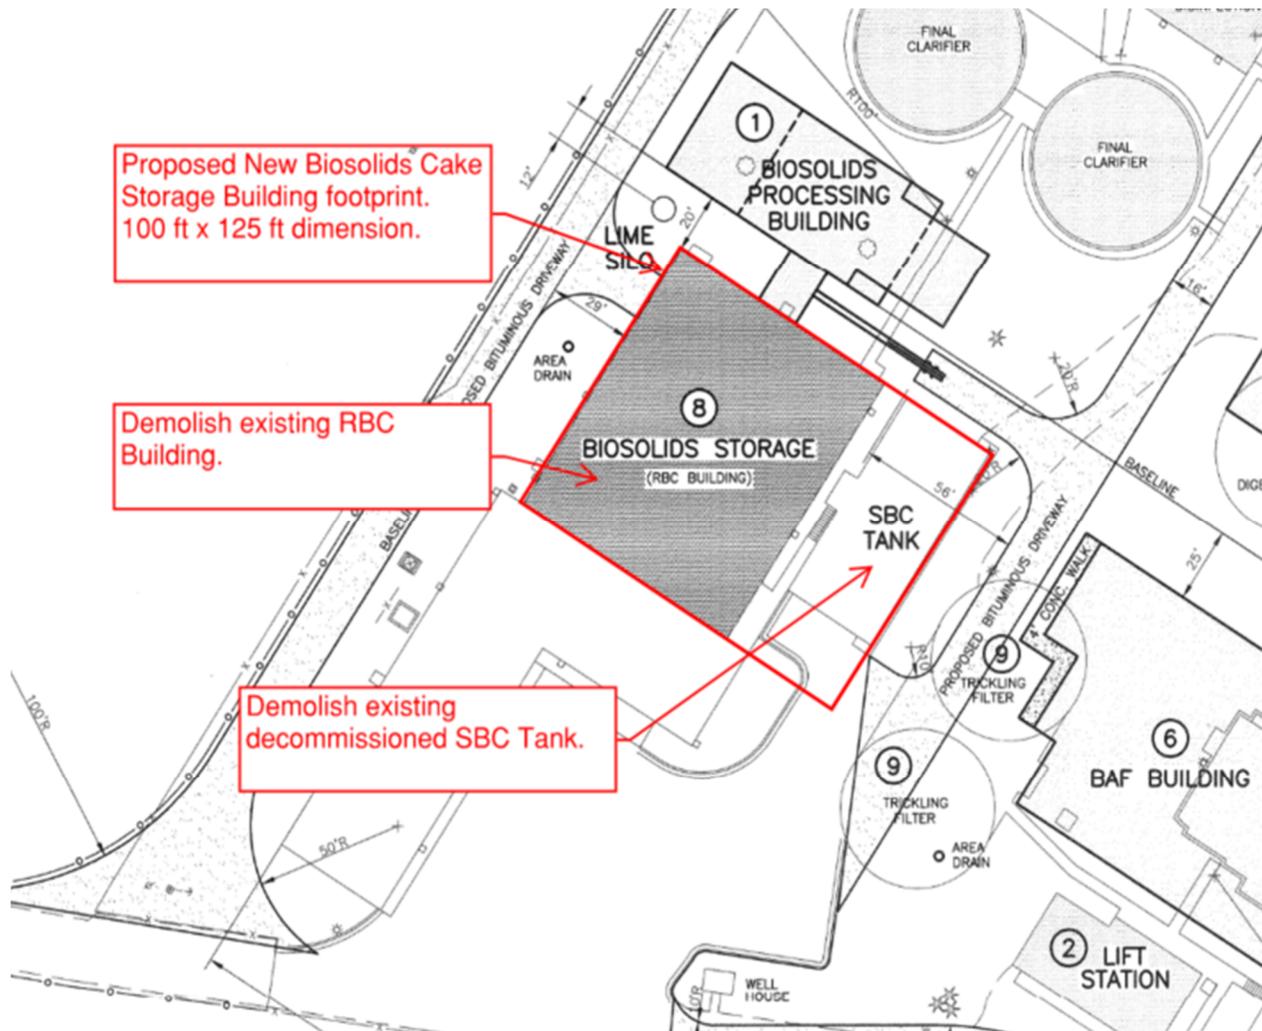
Layout for Proposed Biosolids Cake Storage Building
